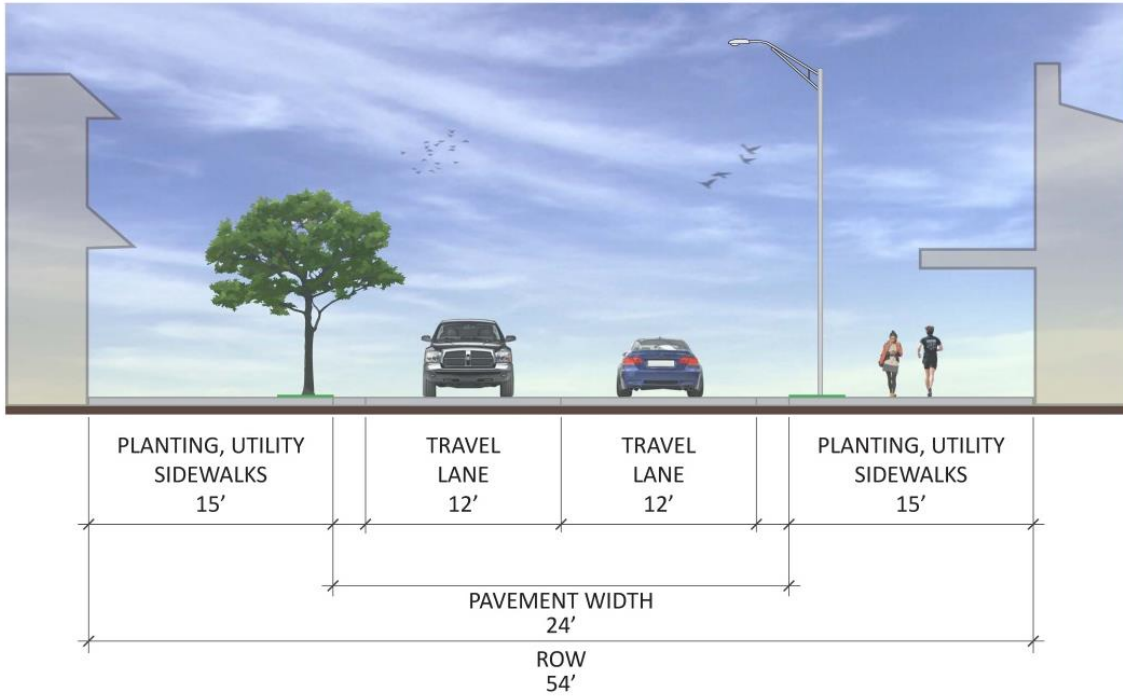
Recommended Urban Local Street Cross-Section - Option 1
